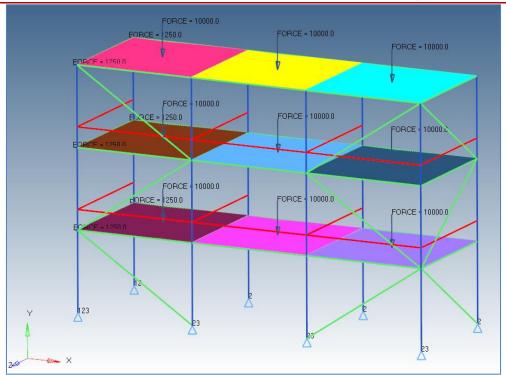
Scaffolding structure leg connection constraints and loads applied in vertical/horizontal direction
